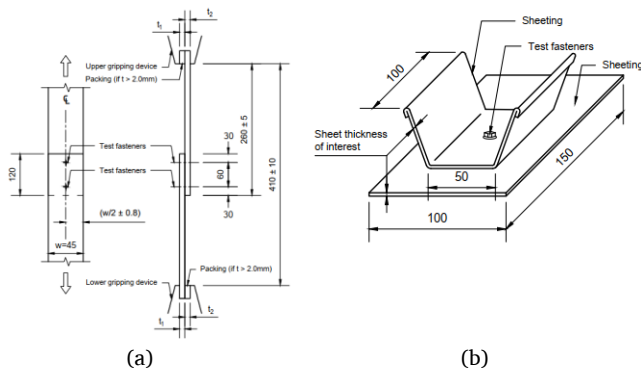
Layout for the lap-joint shear test (a) and layout for the pull-out test (b) of screw.
